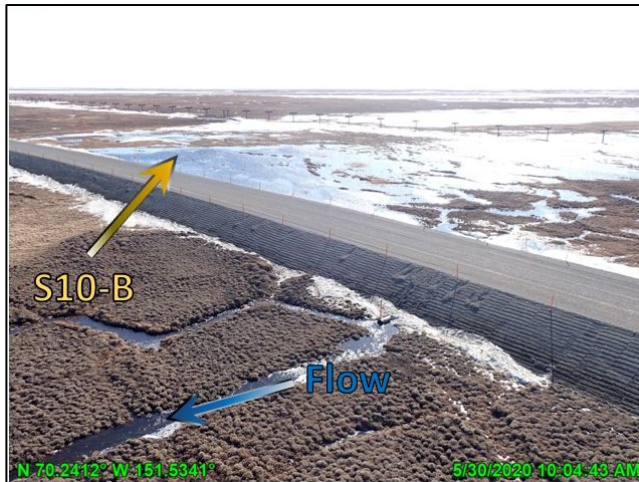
Flow through culvert MT7-63, looking southeast; May 30, 2020
